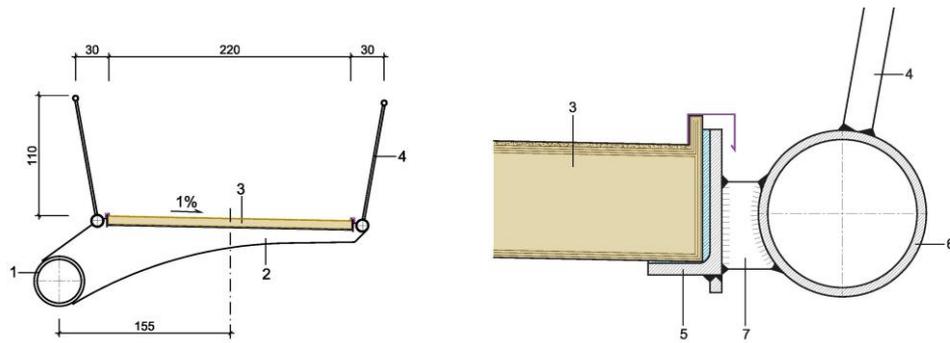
a) Footbridge cross section; b) Railing connection and deck lateral flange detail, with: 1. Main beam ROR 457/40, 2. Consoles, 3. COLEVO deck, 4. Railing, 5. Lateral LNP profiles, 6. Lateral ROR 114/7 profile, 7. Spacers
